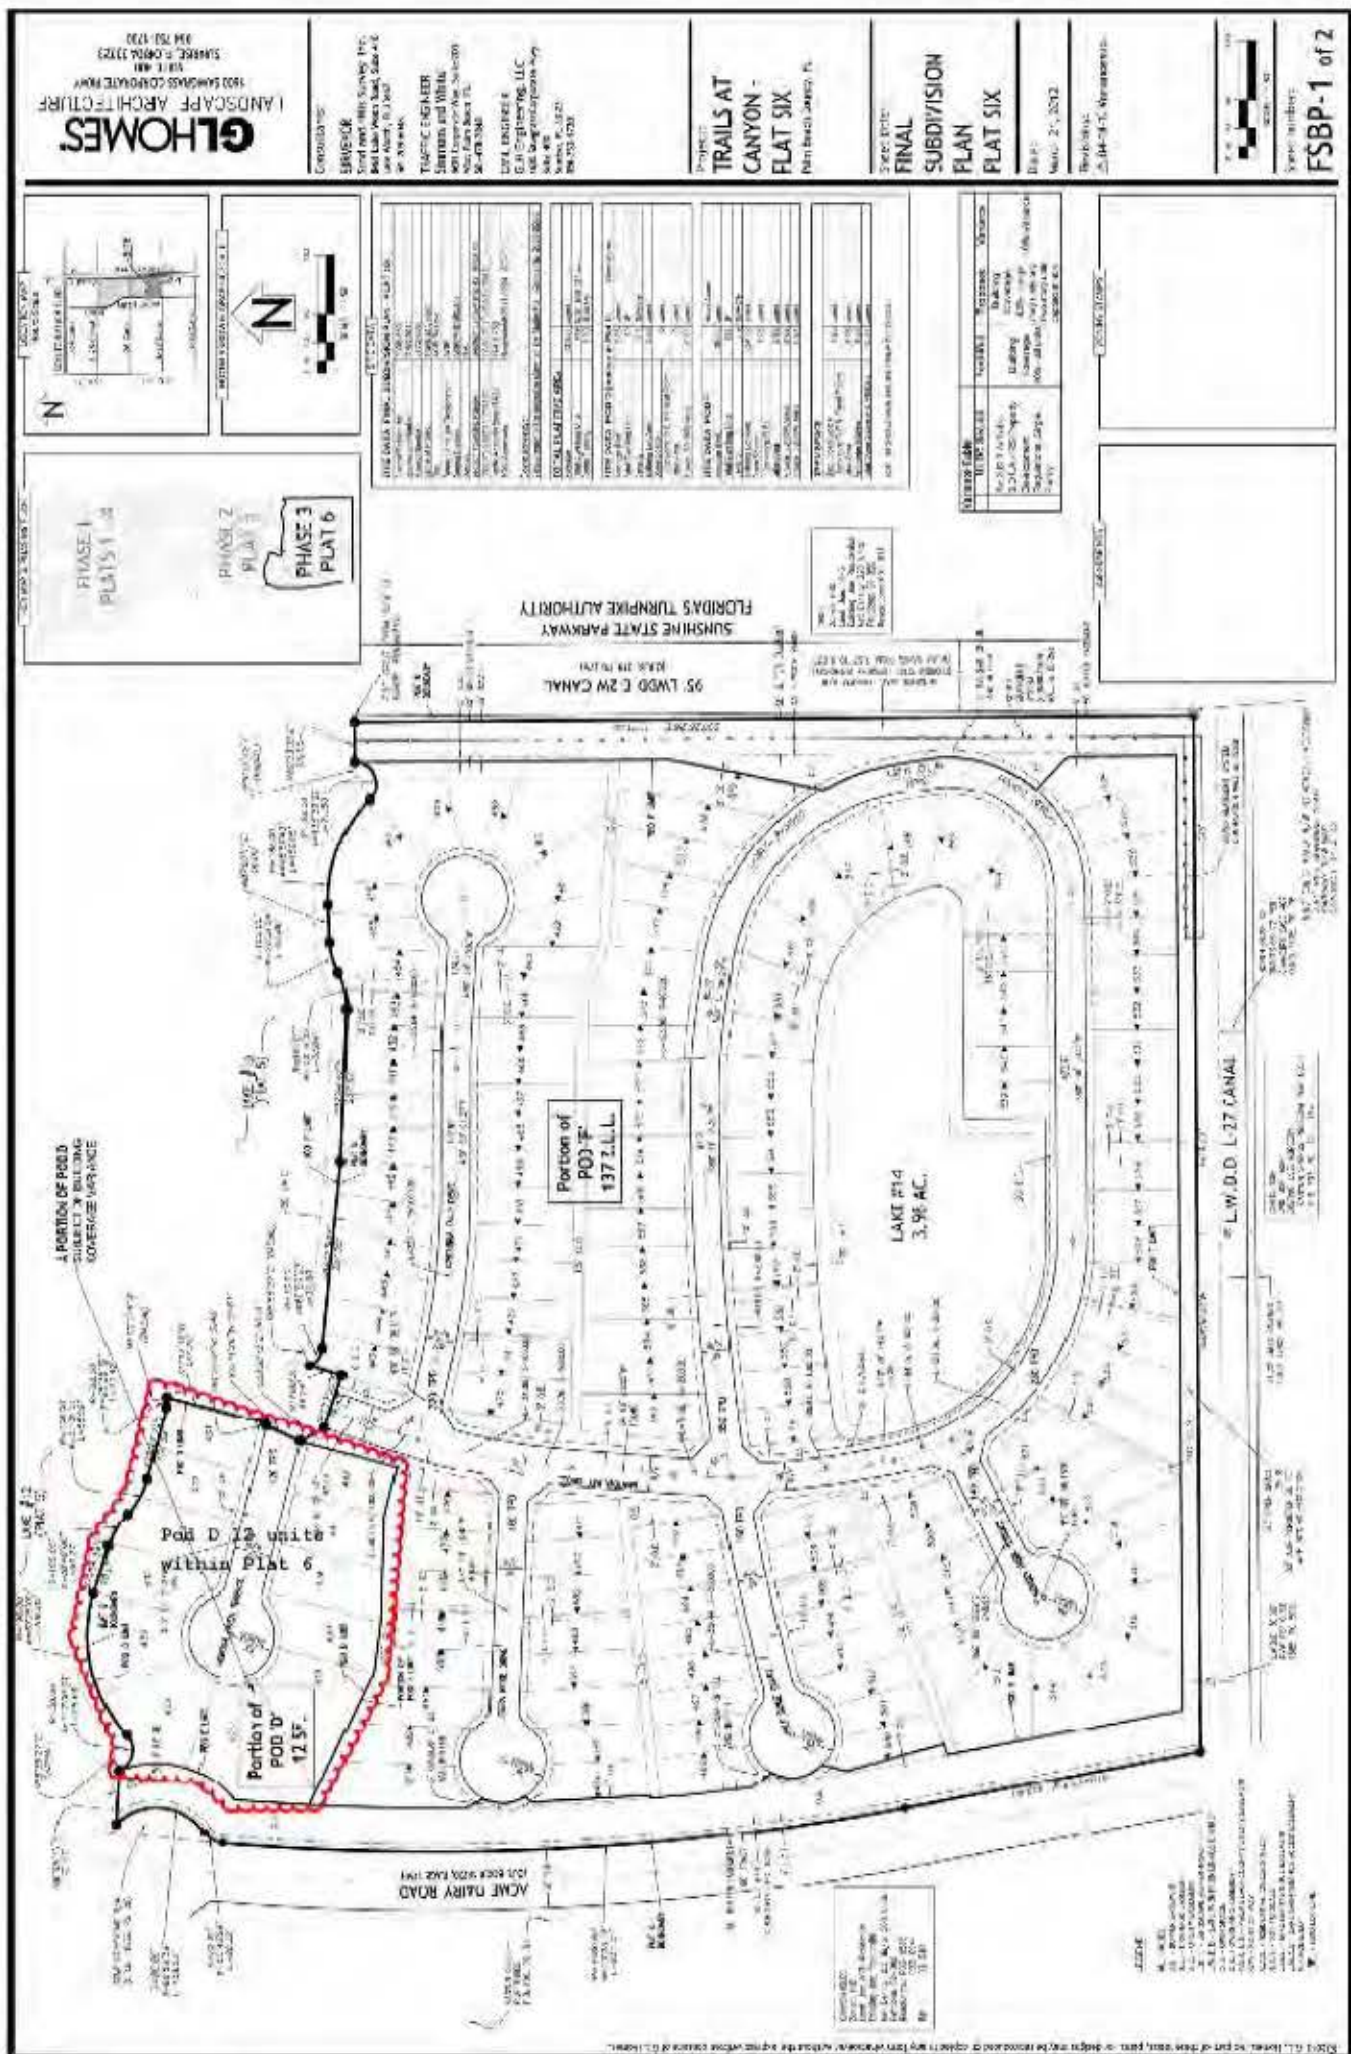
Preliminary Subdivision Plan Plat 6 page 1 dated April 18, 2012
